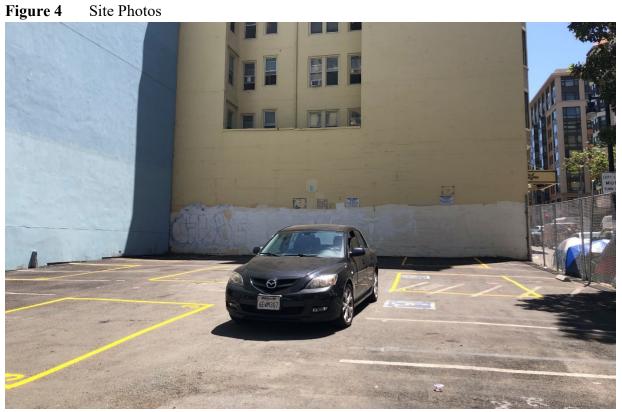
View of the project site looking to the south. The site is currently paved and used for vehicular parking.
